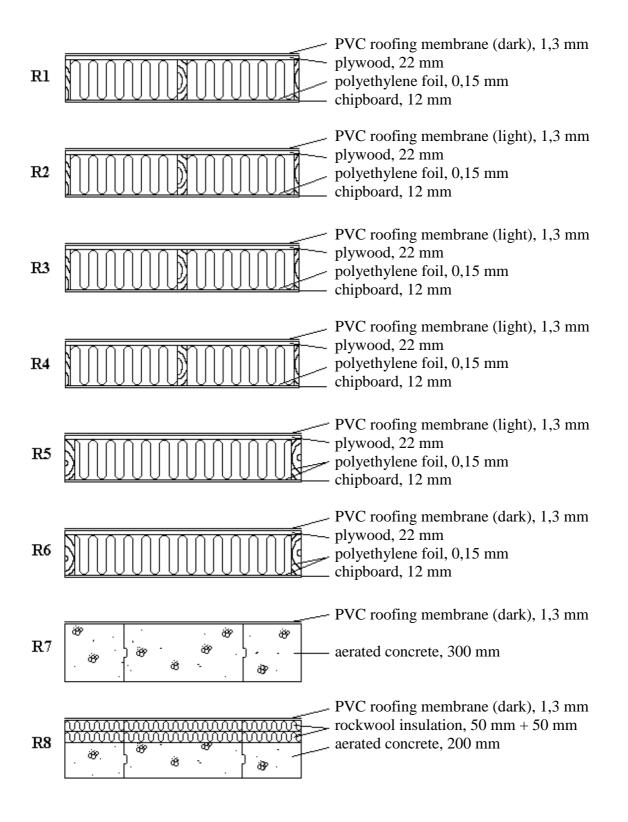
Roof sections. The timber frame sections are insulated with 200 mm glass fiber insulation.
